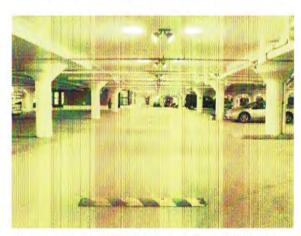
Multiple structural elements coupled with a low ceiling can make it difficult to achieve uniformity, especially between parked cars. In this example, the designer was successful. (Photo courtesy of Larry Leetzow)
